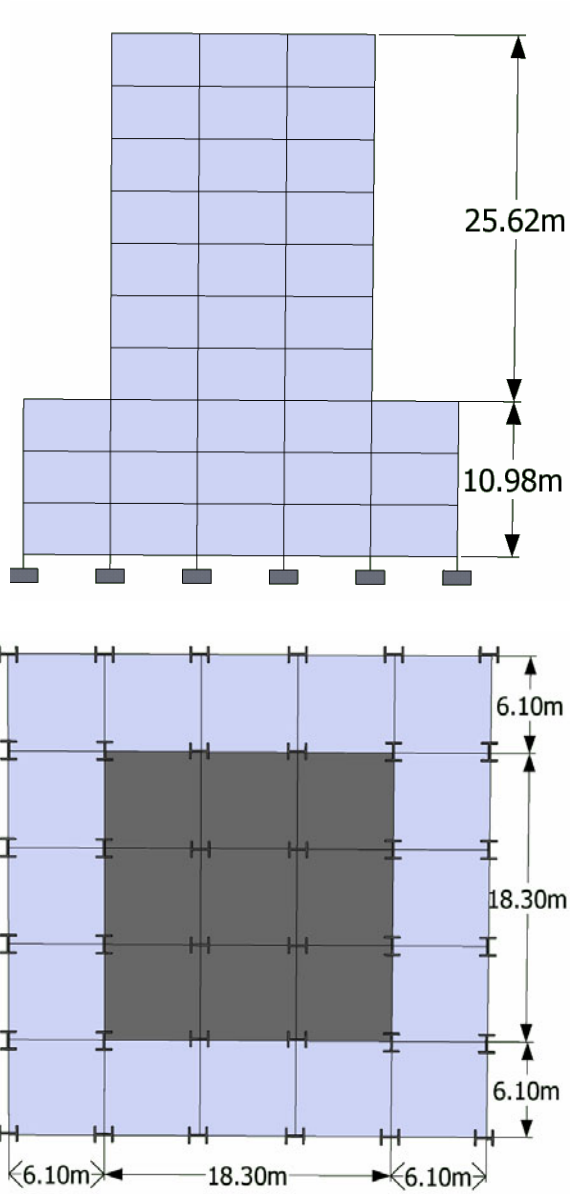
Plan and side view of ten-story, four-bay steel space frame
